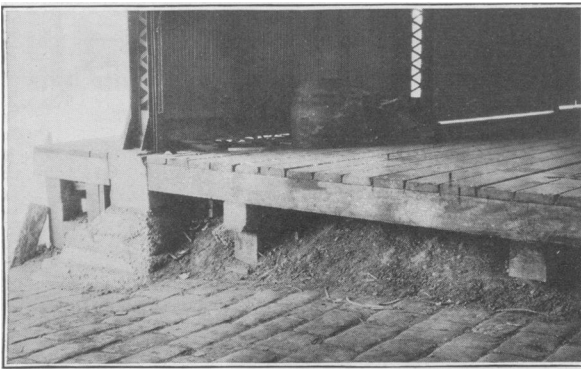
DRIVEWAY SHOWING OPENING BENEATH FLOOR.
